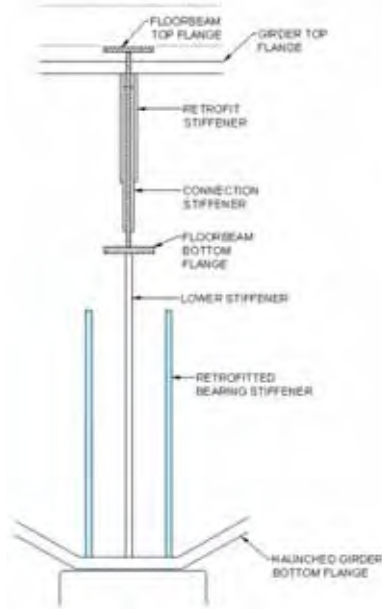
Detail Showing Proposed Retrofit Bearing Stiffeners
